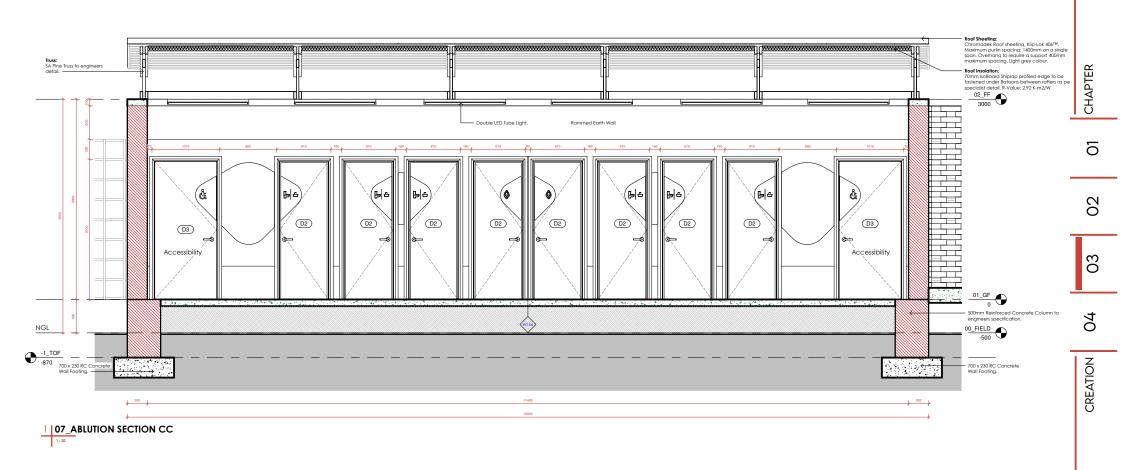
Ablution section CC: sectional detail interior, (Author, 2021)
